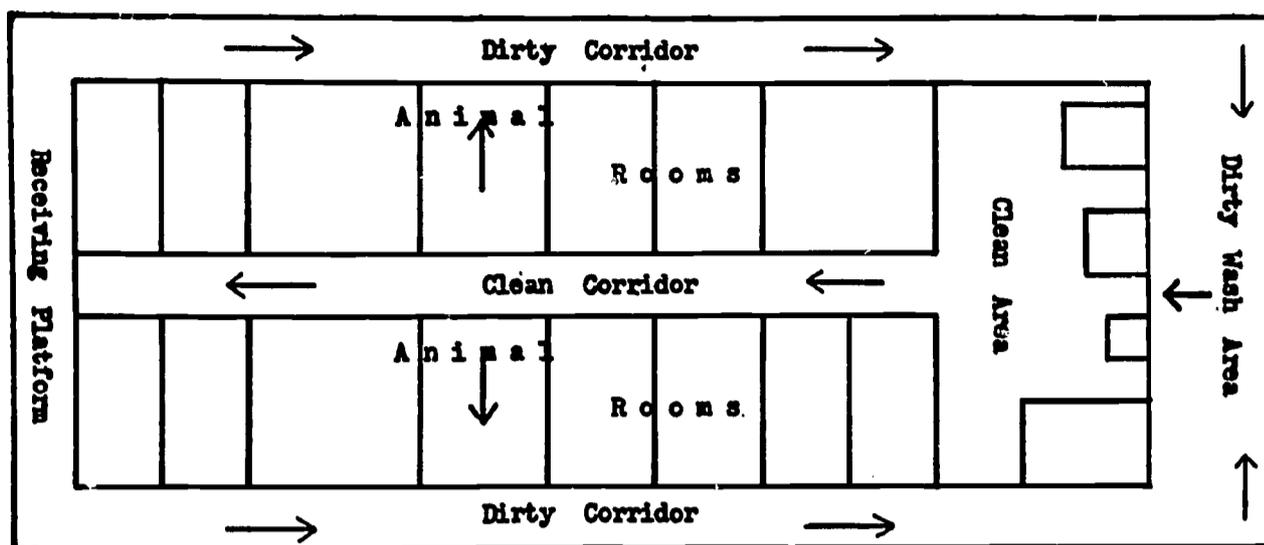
The three-corridor system is best adapted to long, wide buildings. Advantages are one-way traffic patterns, reduced contamination, and flexibility of room usage.
